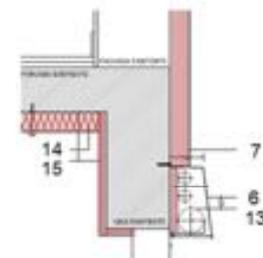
Construction detail D4 Entrance detail. Insulation under the first floor slab (on the ceiling of ground floor) in contact with unconditioned space.
